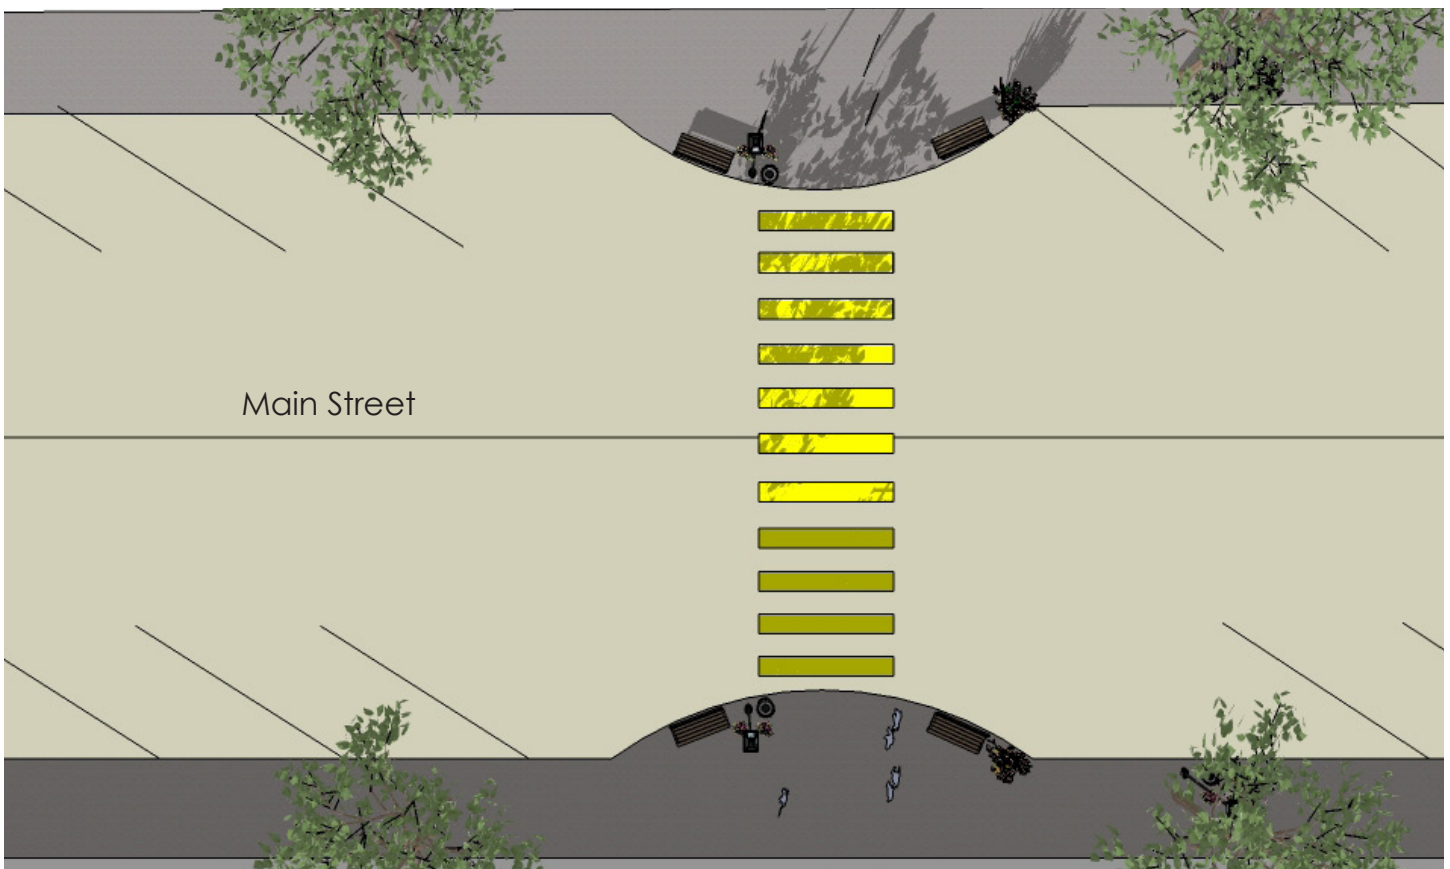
Aerial View of Main Street Mid-Block Crosswalk Near Main & 10th Street Intersection
